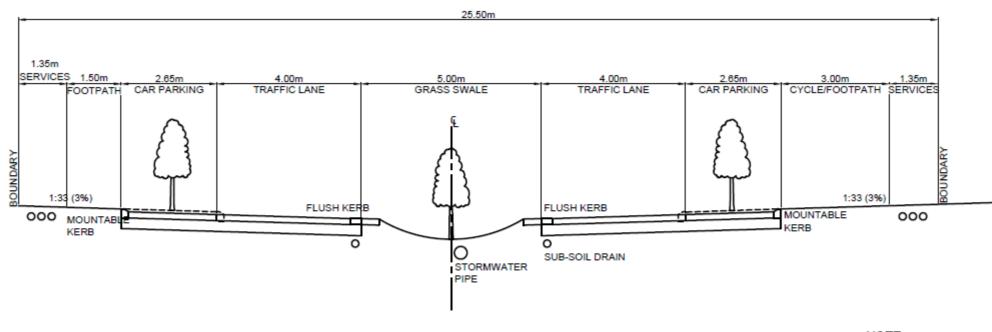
Lorenzen Bay Structure Plan - Road cross sections
